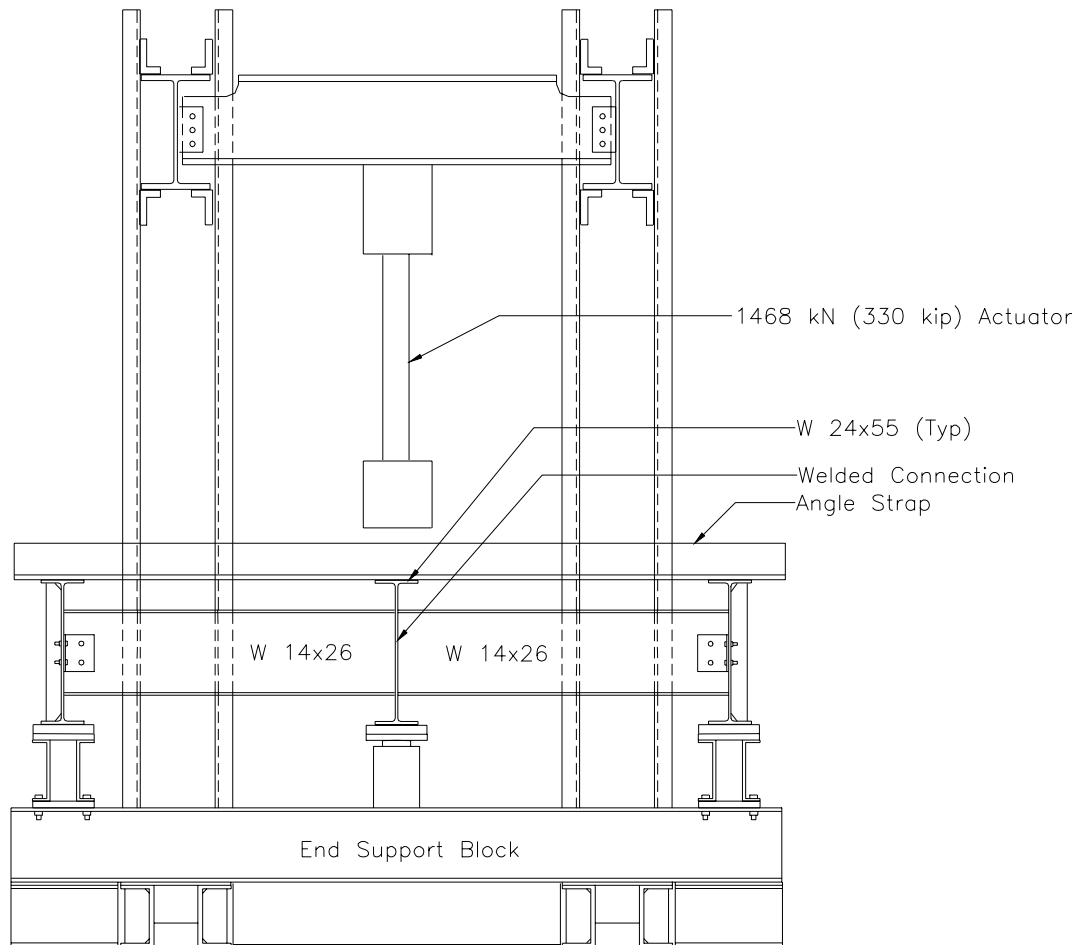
Test setup with 1468 kN (330 kip) linear actuator
